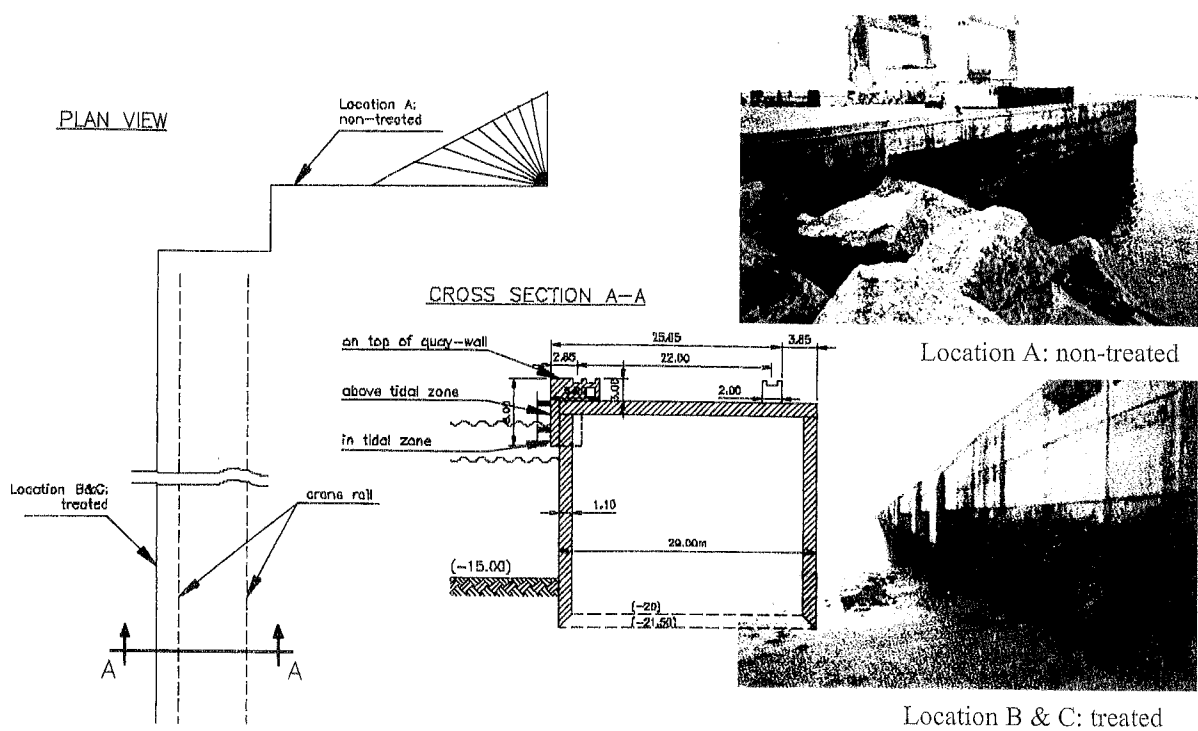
Plan view and cross section of the quay-wall at Zeebrugge Harbor
